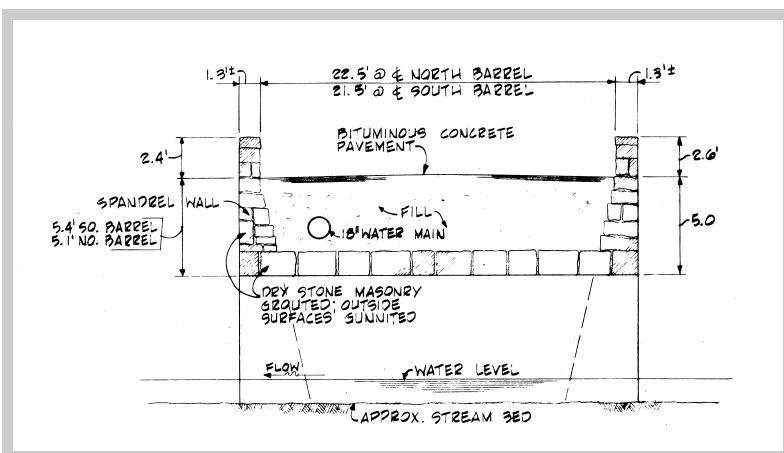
Transverse section through the Winter Street Bridge, taken through the crown of the arches.
